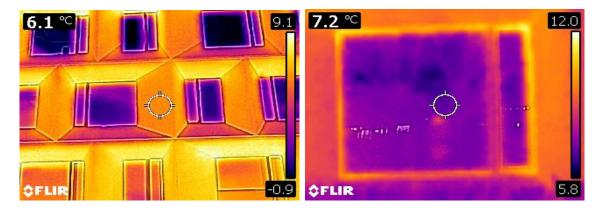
Heat loss from the precast concrete planes in the façade (left), and at window frames (right).
